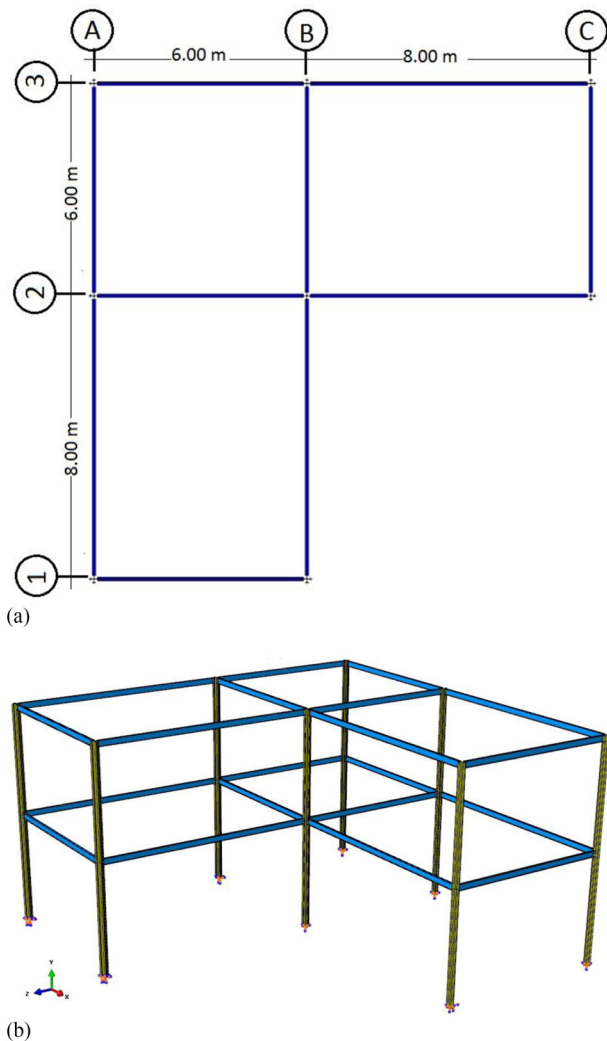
(a) Plan view of an irregular building and (b) perspective view of a building with boundary conditions (Units: meters)
